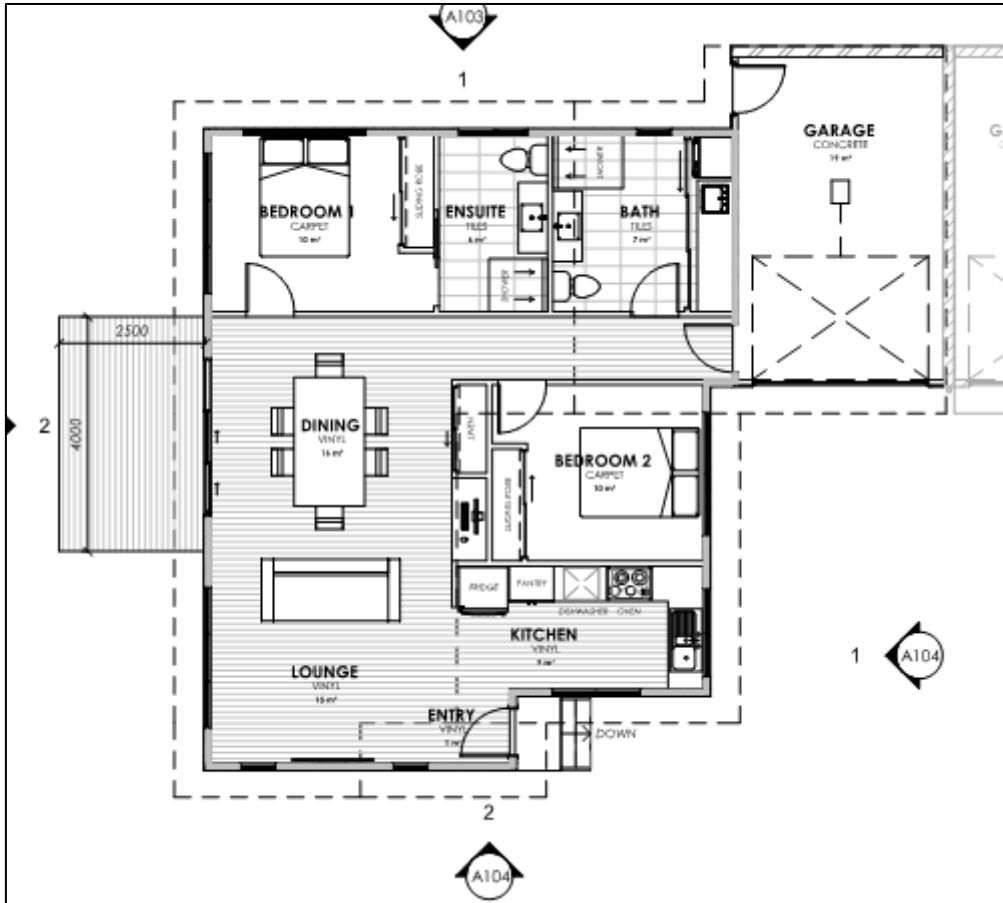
Floor plan of proposed unit (n+b, 2018)
